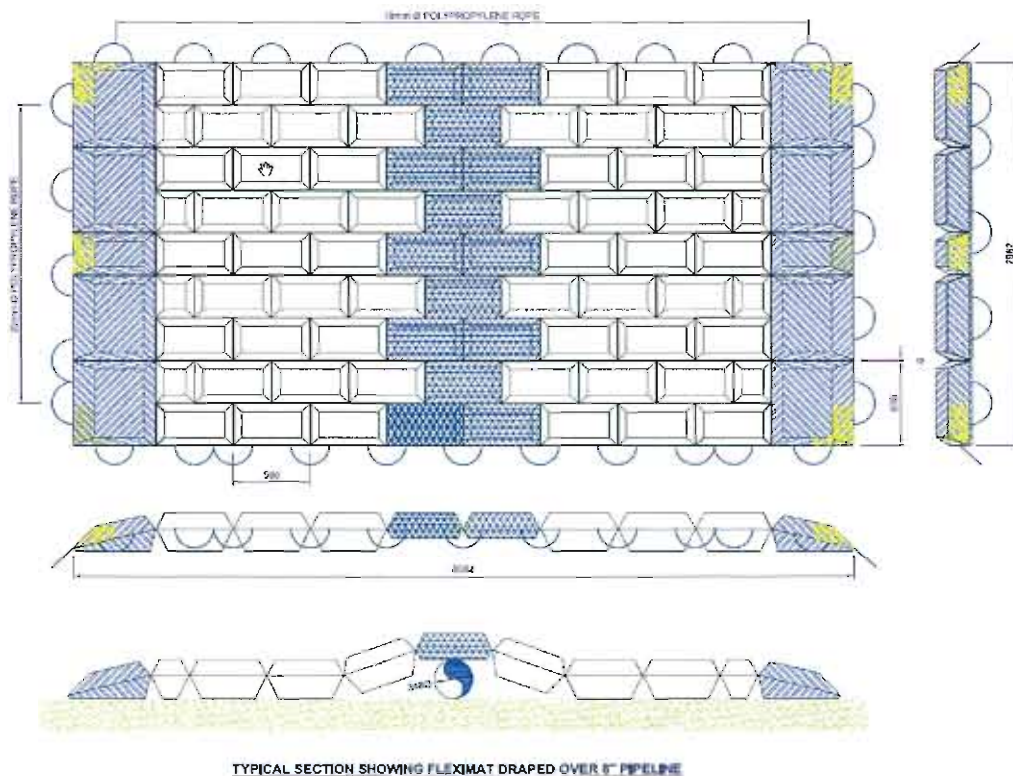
Drawing of Typical Concrete Protection Mattress (Production Flowline)
